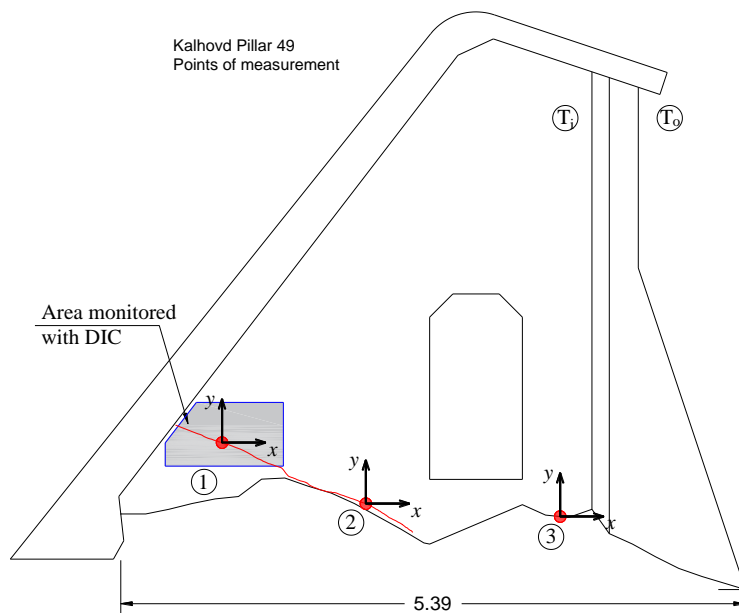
Monitoring plan of pillar #49 from Kalhovd Dam.
